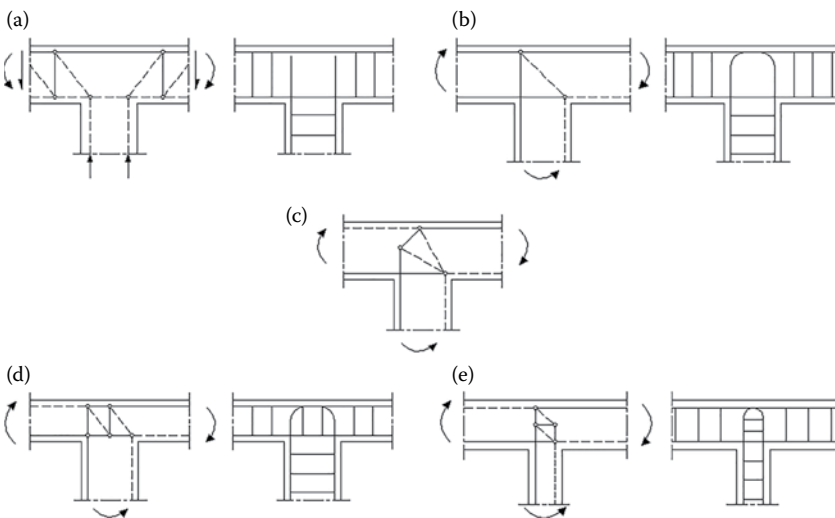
Suggested *STMs* and corresponding details for tee beam–column connections: (a) due to gravity loads and (b–e) due to lateral loads.
